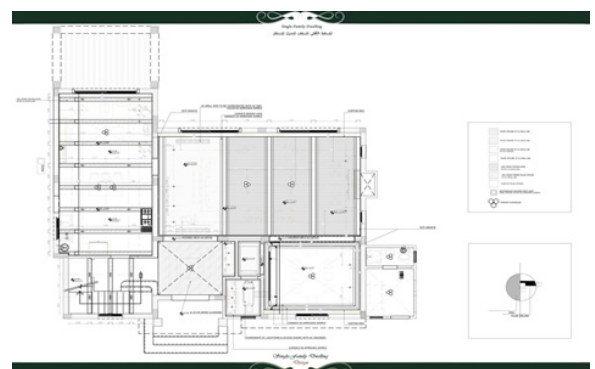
((Author, 2018)): Ceiling plan for a single-family dwelling.
